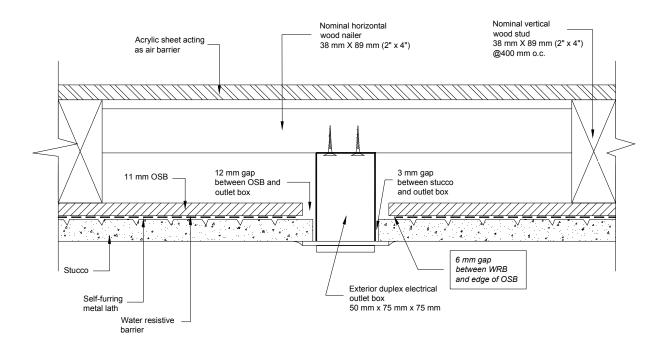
Wall/outlet box detail for specimens No. 1-No. 4 Horizontal section
